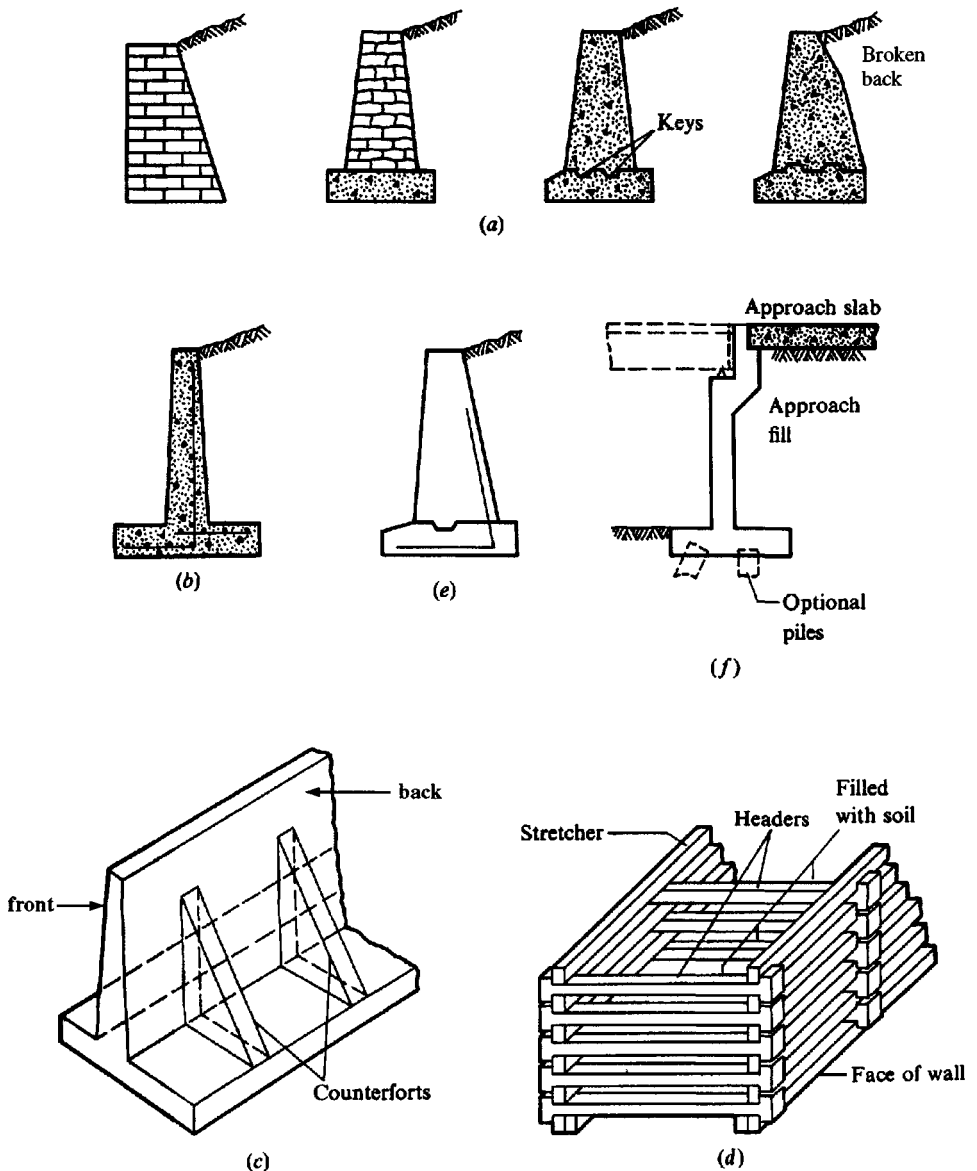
Types of retaining walls. (a) Gravity walls of stone masonry, brick, or plain concrete—weight provides stability against overturning and sliding; (b) Cantilever wall; (c) Counterfort, or buttressed wall—if backfill covers the counterforts the wall is termed a counterfort; (d) Crib wall; (e) Semigravity wall (uses small amount of steel reinforcement); (f) Bridge abutment.
